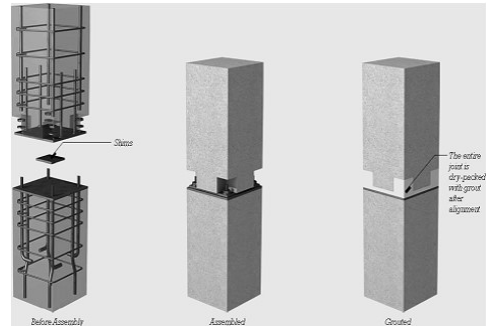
Instructions for joining two (and no more) prefabricated columns.
